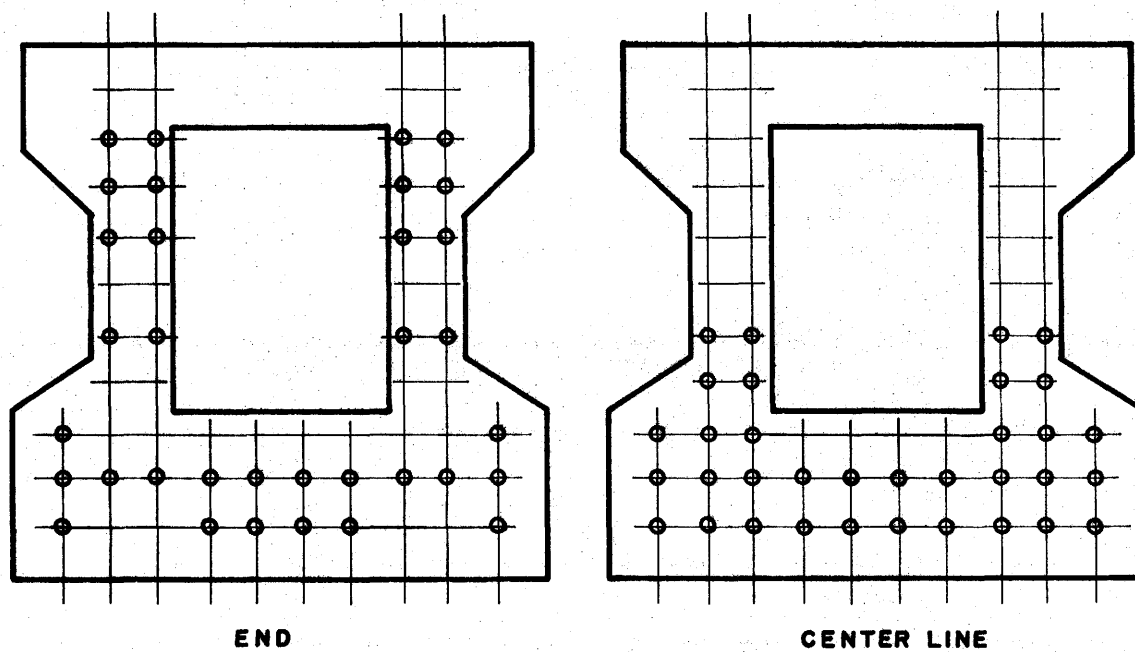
CENTERLINE AND END SECTIONS OF BEAM WITH IMPROPER DRAPING OF STRANDS
